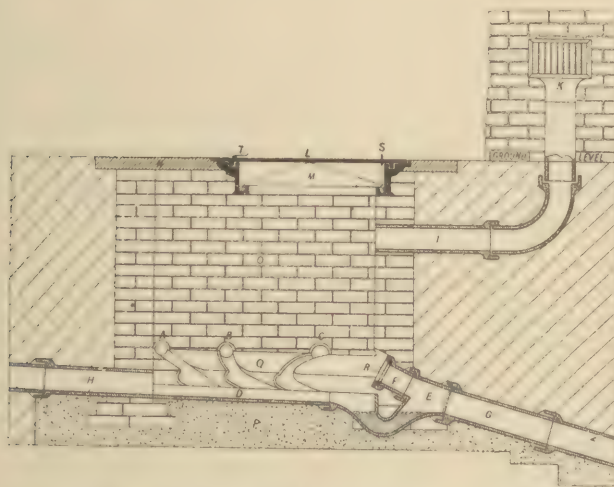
SECTION OF DISCONNECTING CHAMBER.
